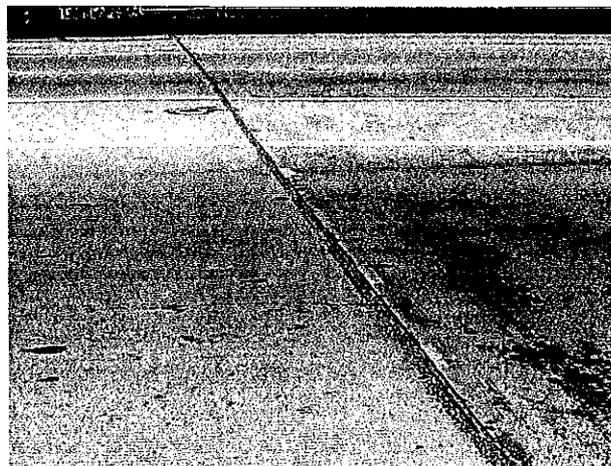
Bridge 29-0226L/R/S deck joint (non-suspect)
